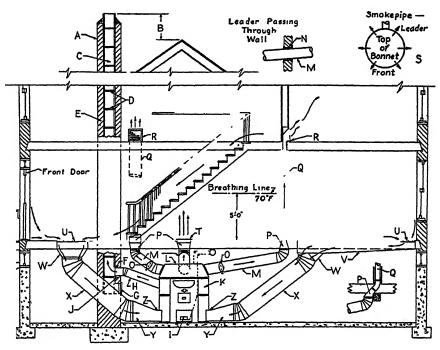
A Sectional View of a Typical Plant Showing GOOD INSTALLATION PRACTICE²
